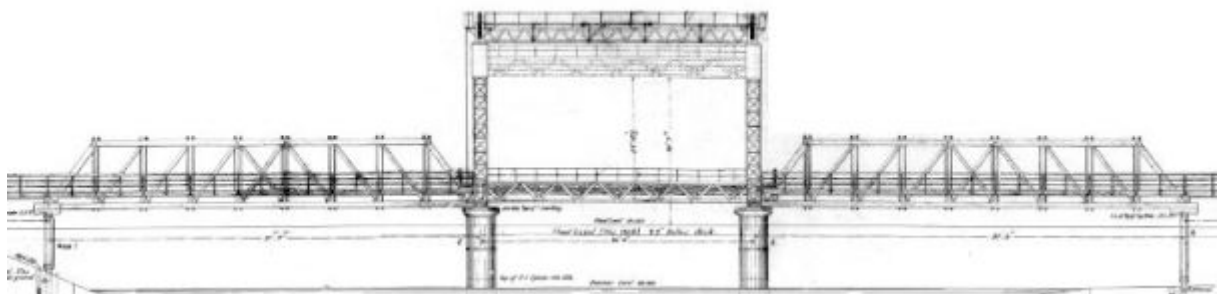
Swan Hill Bridge Elevation – 1896 (Source: Allan)
